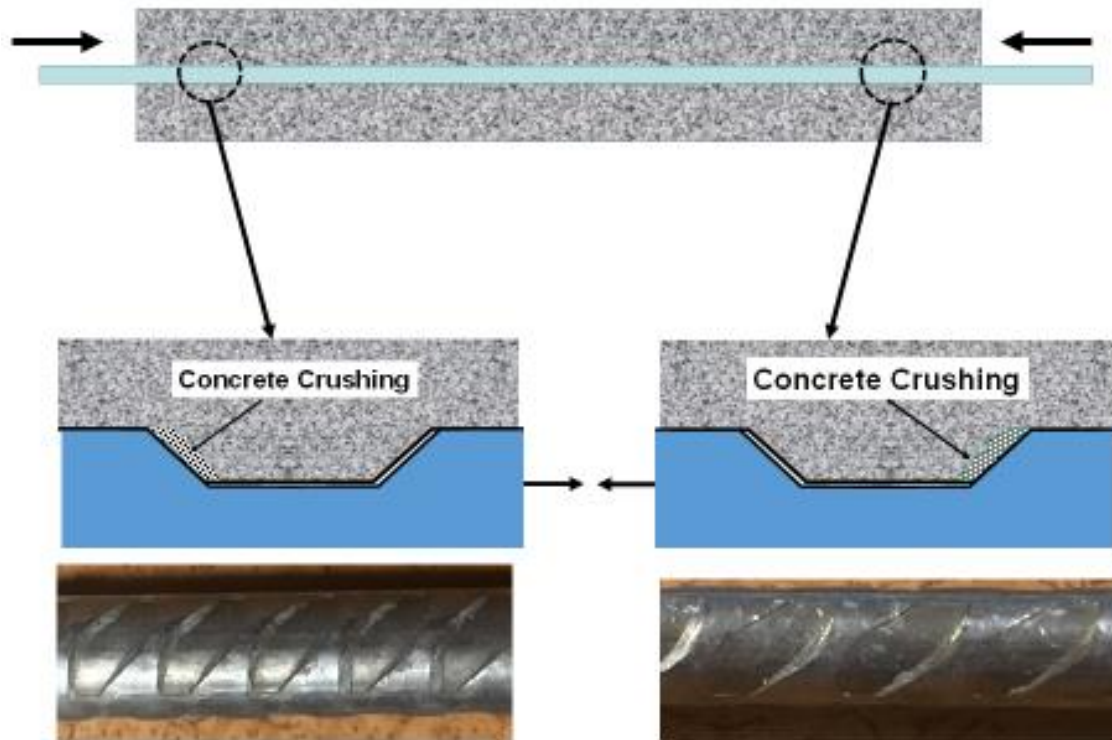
Hypothesized Sidewall Concrete Crushing (Beck, 2019)
